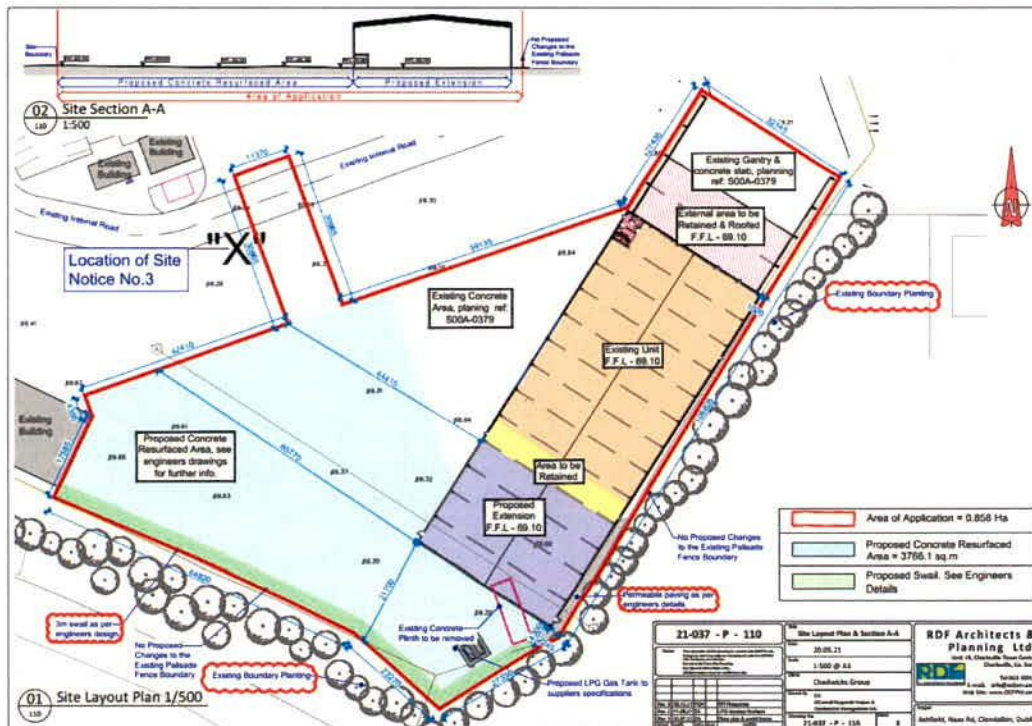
Site Layout Map (Credit: RDF Architects and Planning Ltd.)
